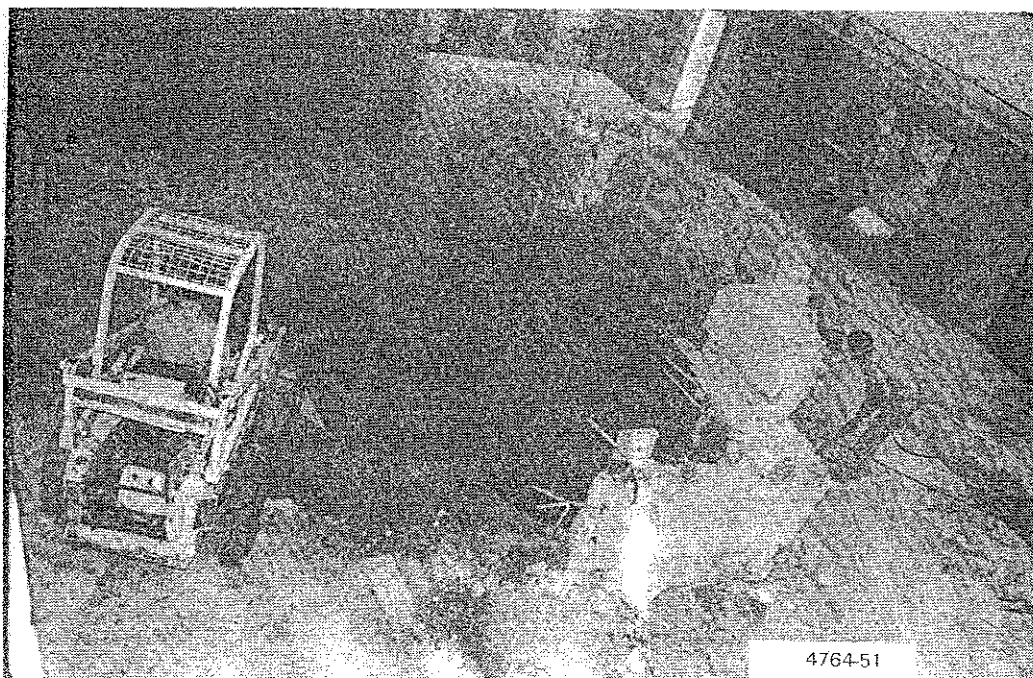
Concrete Rubble Being Pushed Into Pool Tank Cavity
